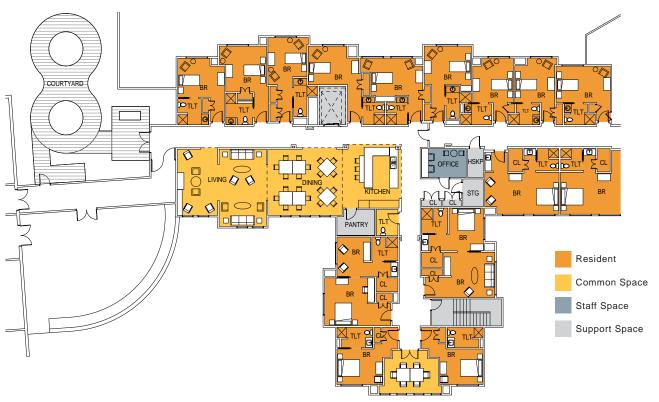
The renovation at the Grove at Covenant Village of Cromwell opens up the previously-existing double-loaded corridor at the Living, Dining, and Kitchen areas to let natural light deep into the floor plate.
